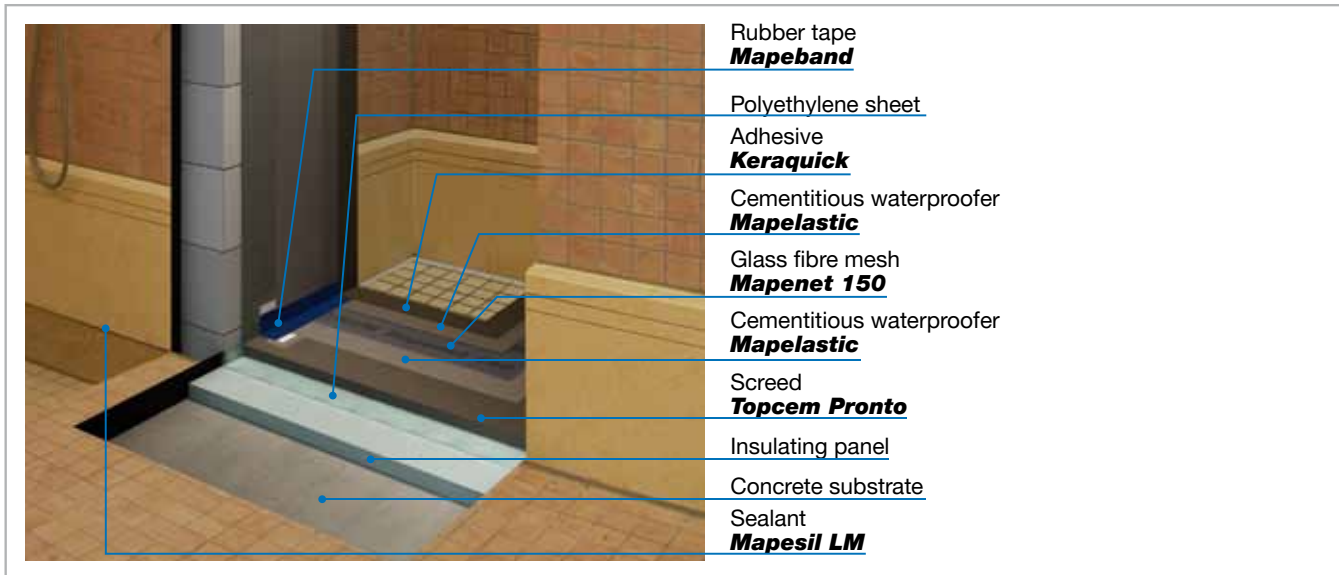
Example of an isolated screed installed over a layer of thermal insulating panels
